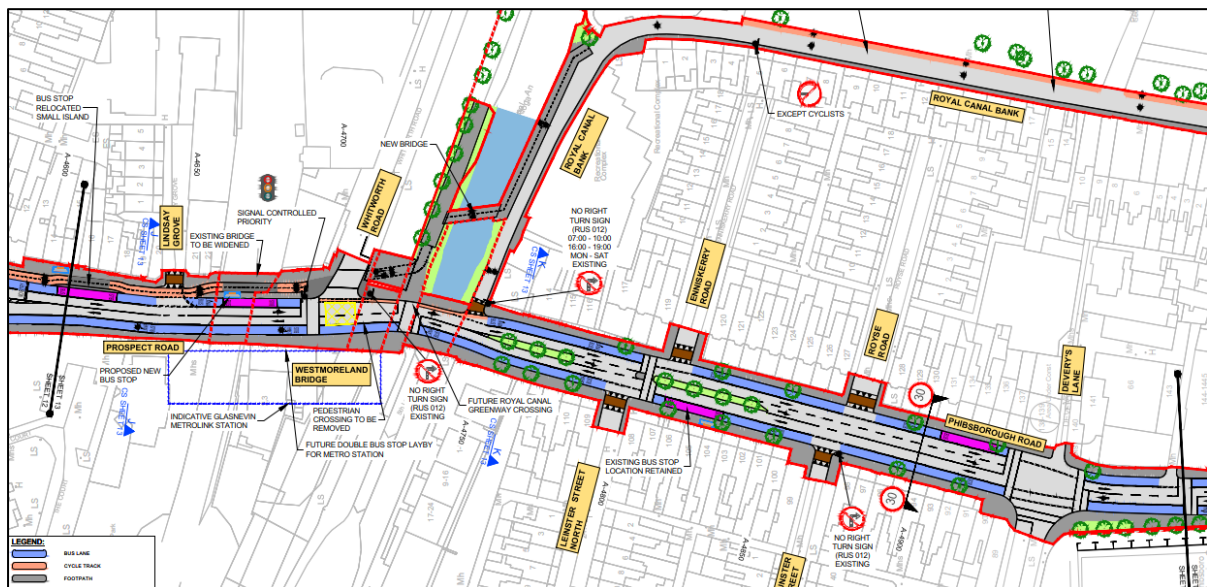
Extract from General Arrangement Drawing Sheet 13
